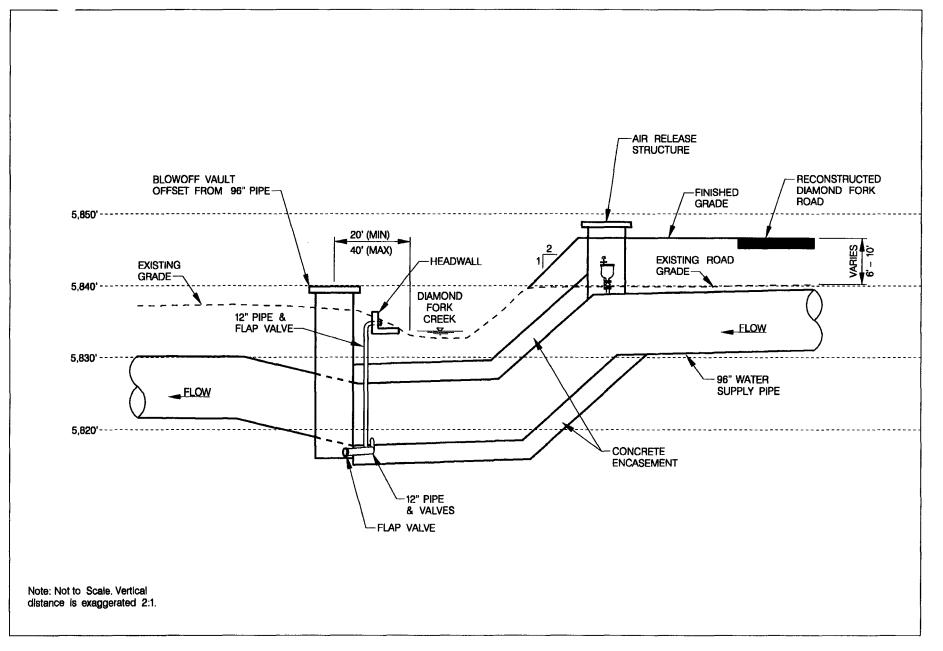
Diamond Fork Siphon Creek Crossing Profile
